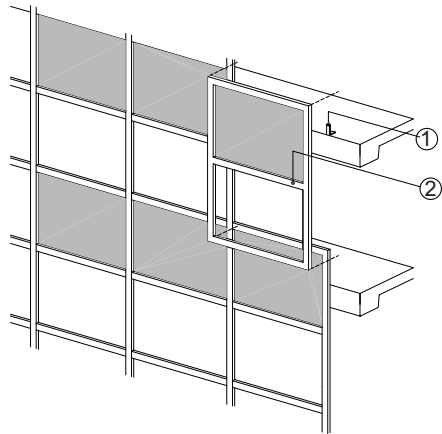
Stick system — joinery — typical expansion joint assembly
